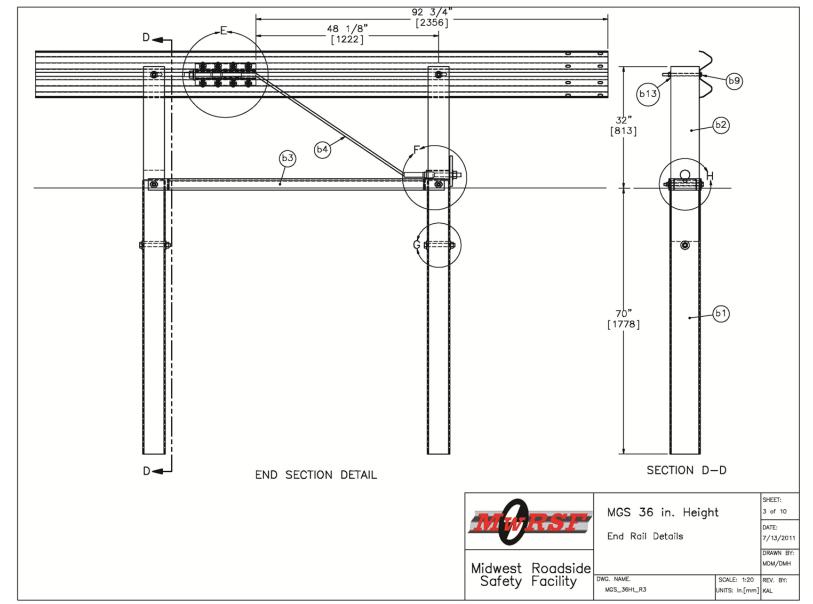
BCT End Anchor Details, Test No. MGSMRH-2
